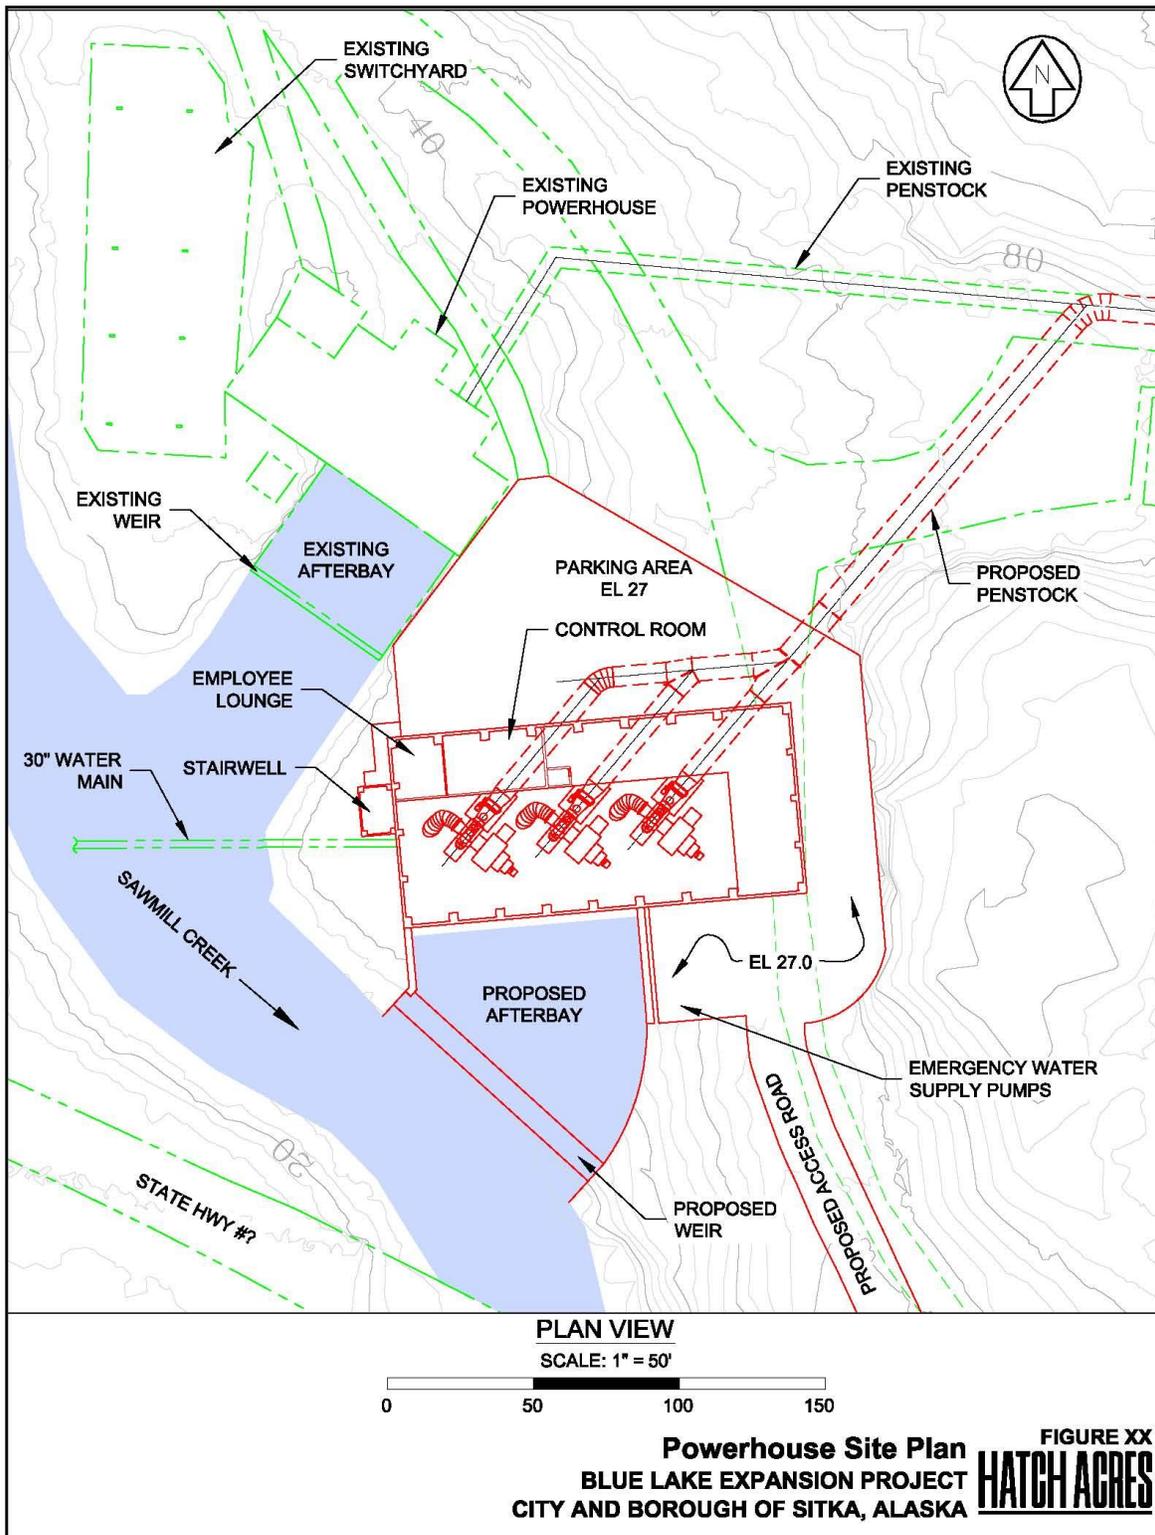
Detail of Powerhouse and Afterbay Arrangement.
